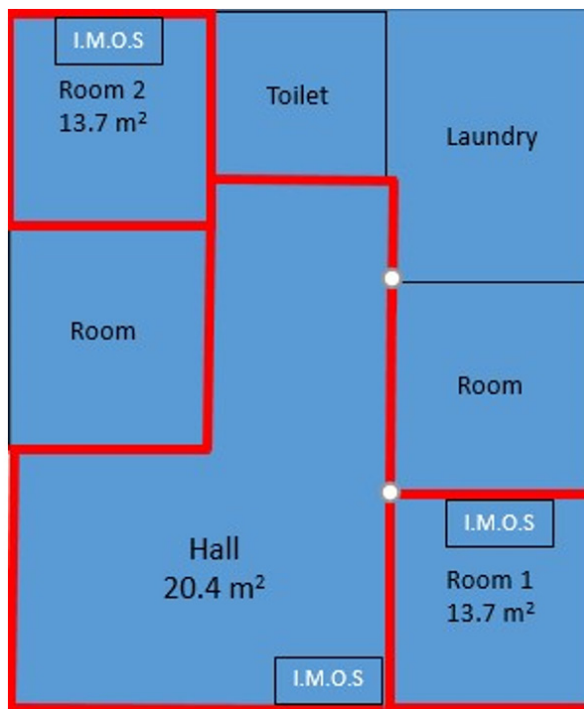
The size of hall, room 1 and room 2 at 17th College, UPM
